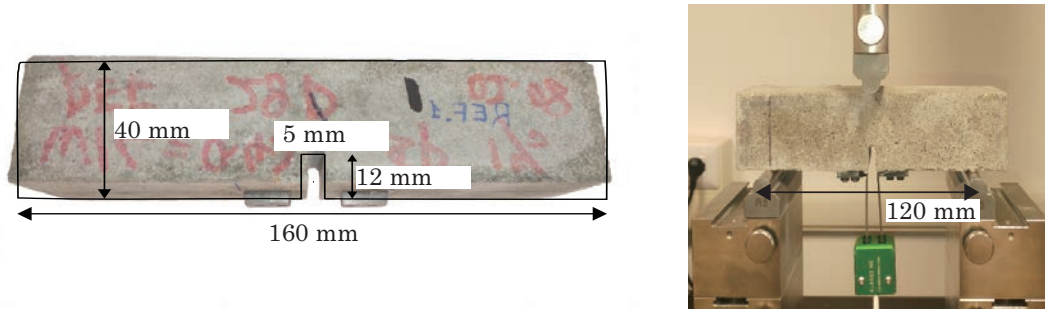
Notched specimen (left) and flexural test setup (right)
